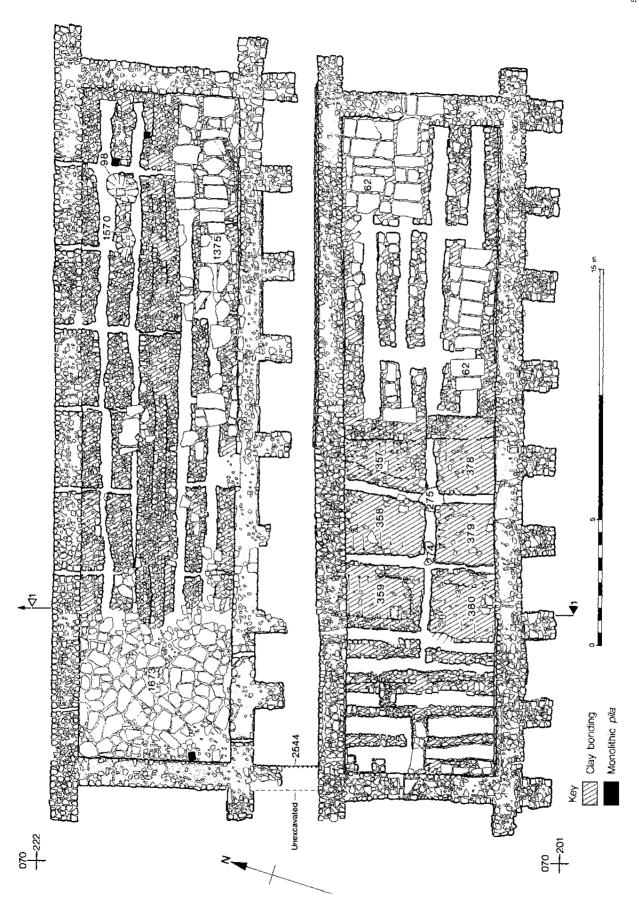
Plan of both horrea, showing Building 198 Phase d and Building 197 Phase d
